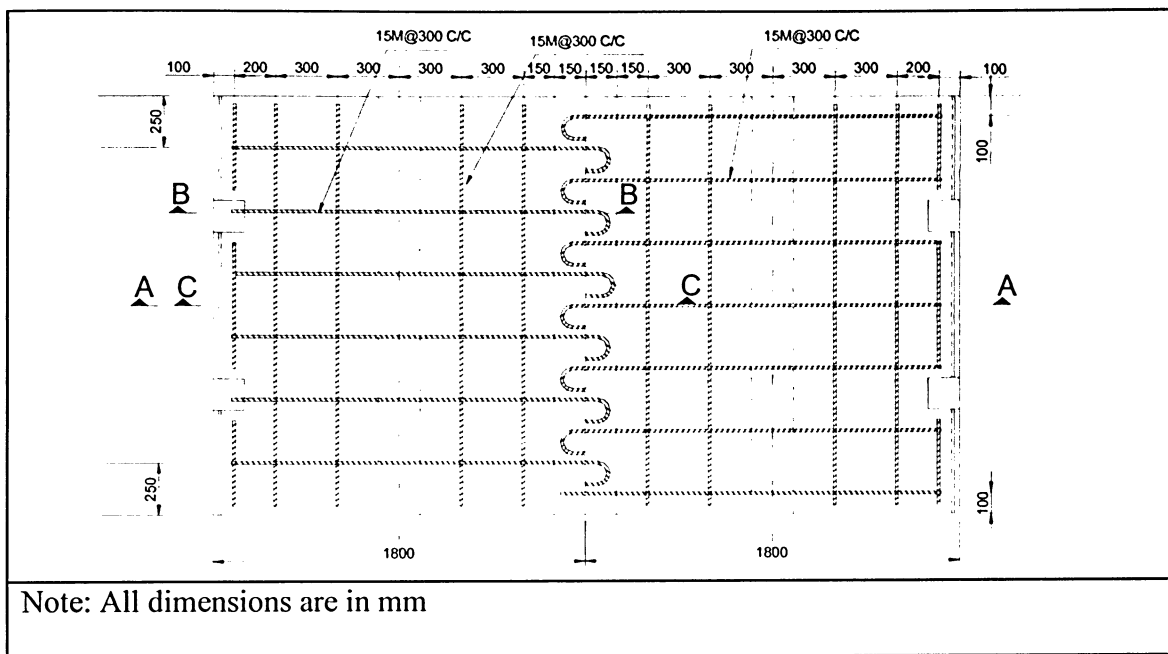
(a) Plan of Top Rebar Arrangement for Model M1
